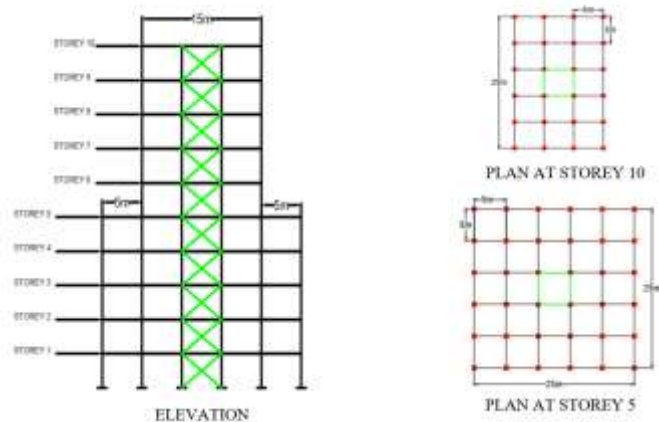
MODEL-C2 GEOMETRIC IRREGULARITY-FLAT SLAB BUILDING WITH BRACINGS
